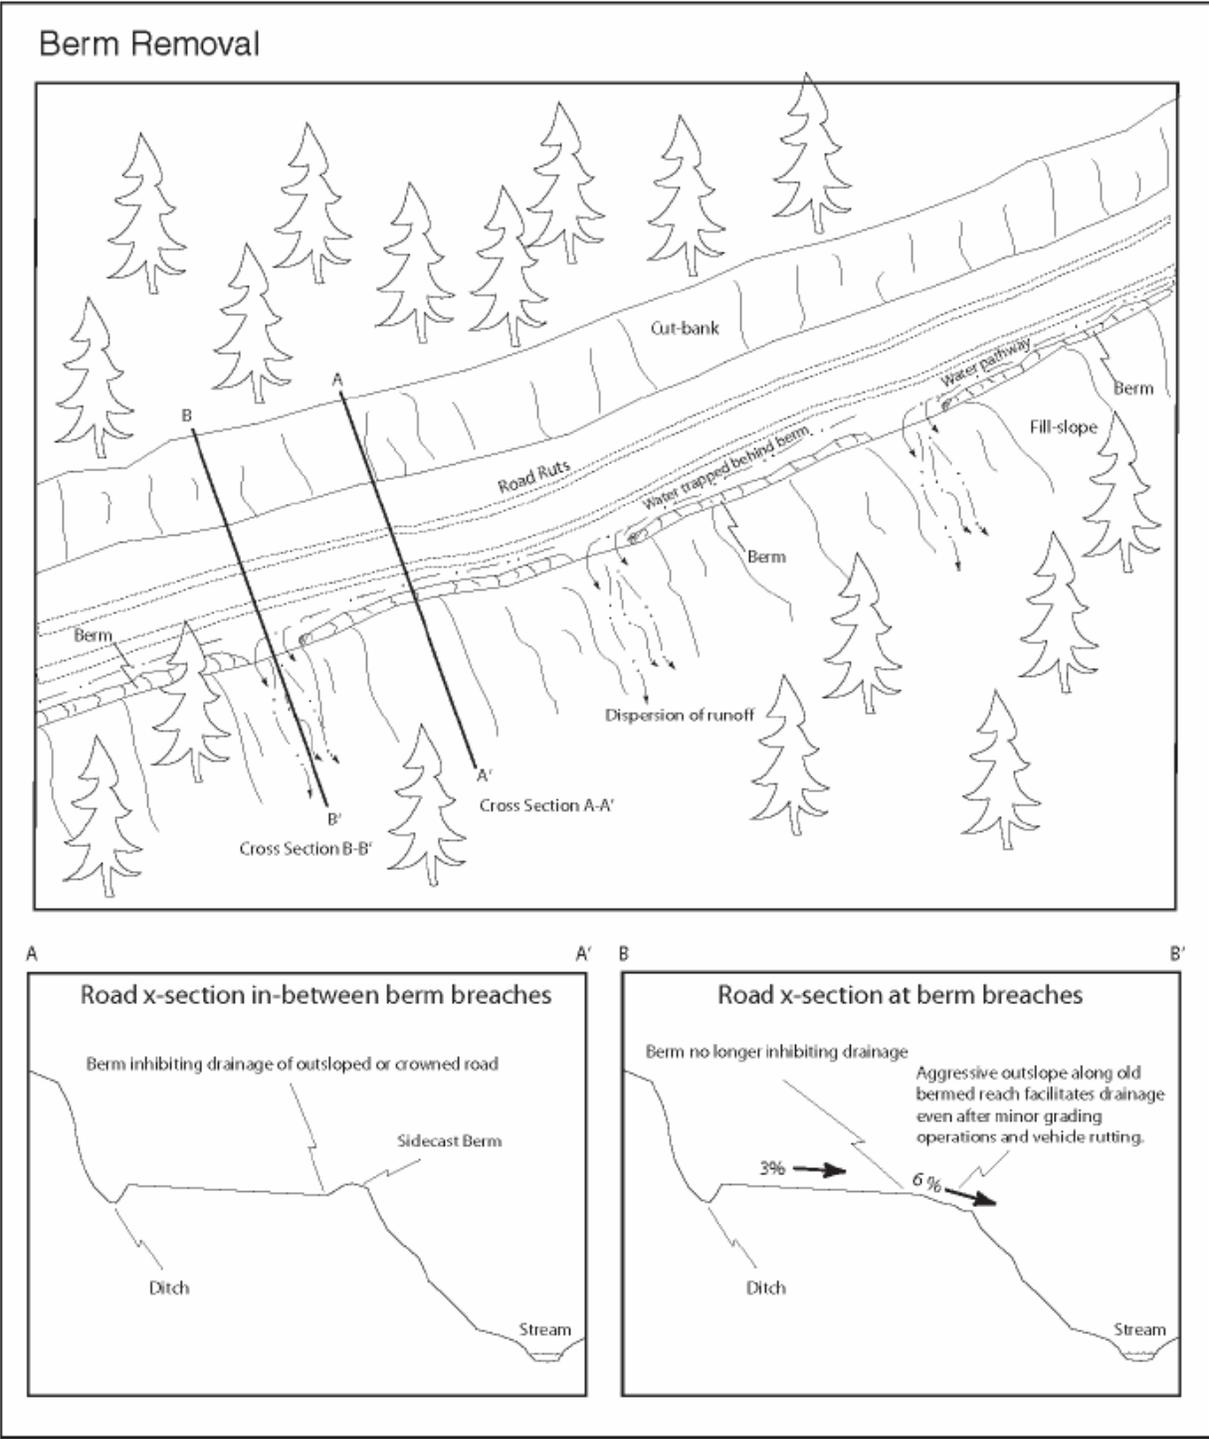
Berm removal for improved drainage on outsloped and crowned roads.
